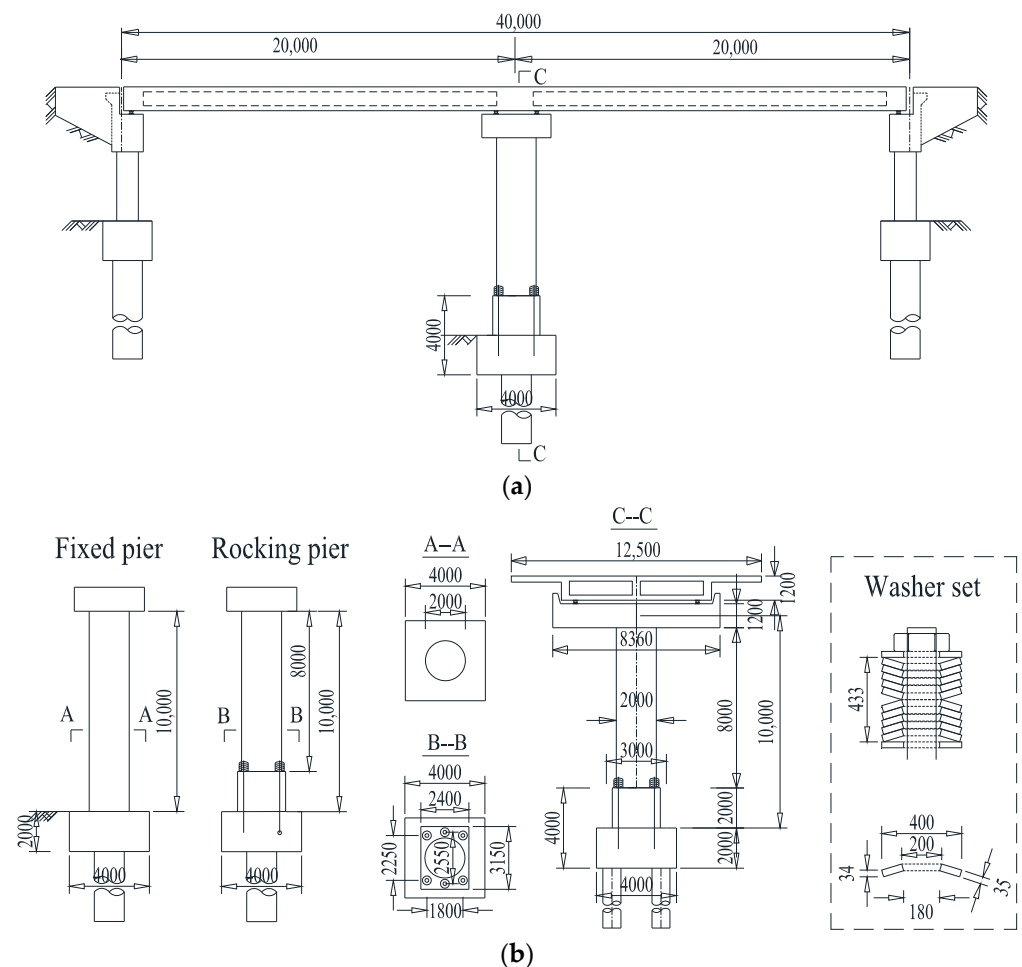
Geometric layout of two-span continuous concrete-girder bridge (Unit: mm): (a) general layout, (b) detailed dimensions.
